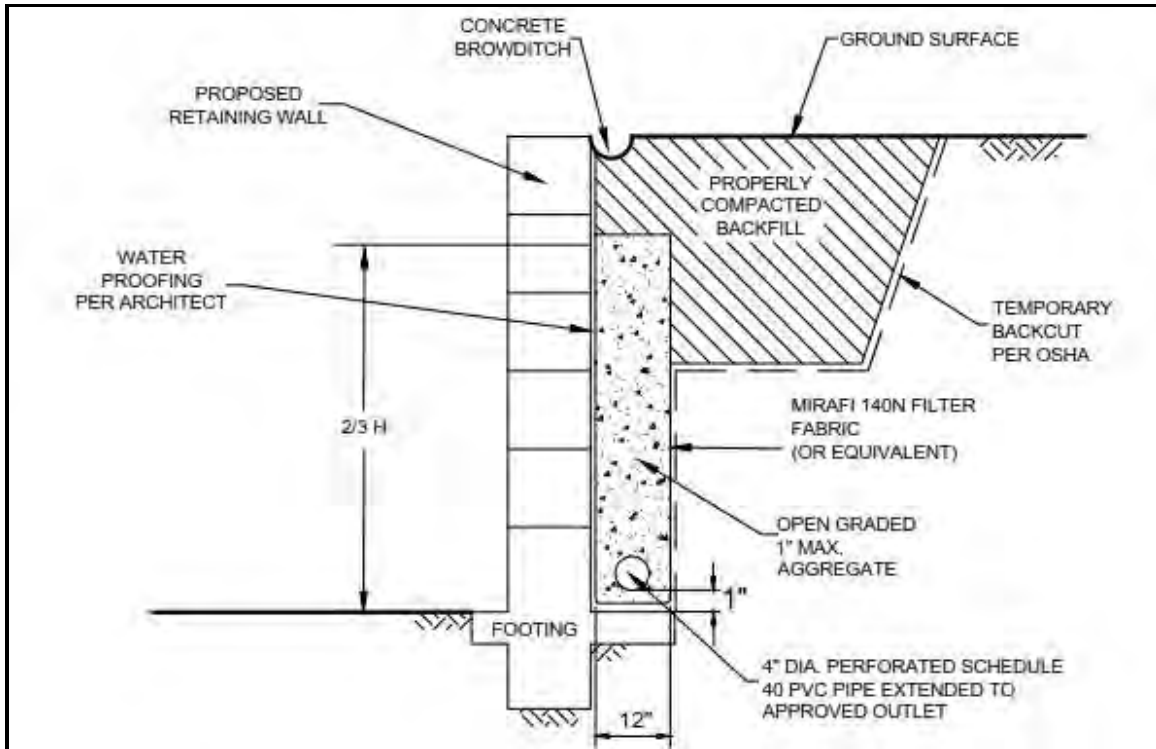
Conceptual Design for Retaining Wall Drainage
